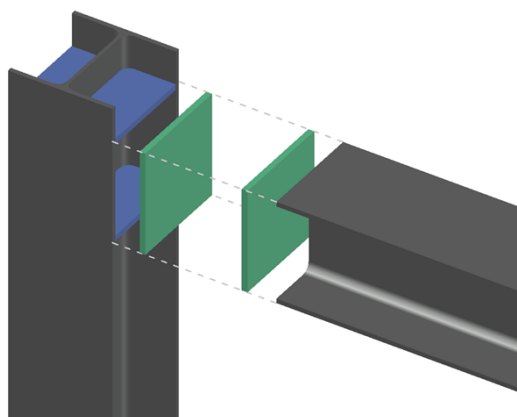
Illustration of stiffeners (blue) and connection plates (green) for connection between steel beam and column
